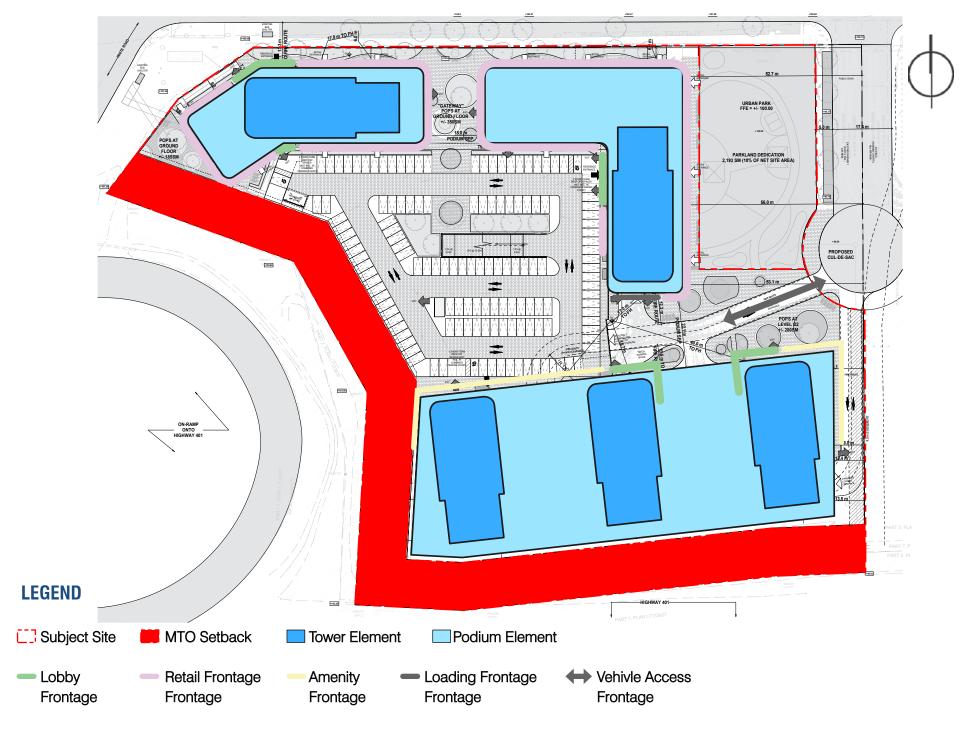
LANDSCAPE PLAN (MHBC PLANNING, URBAN DESIGN & LANDSCAPE ARCHITECTURE)
